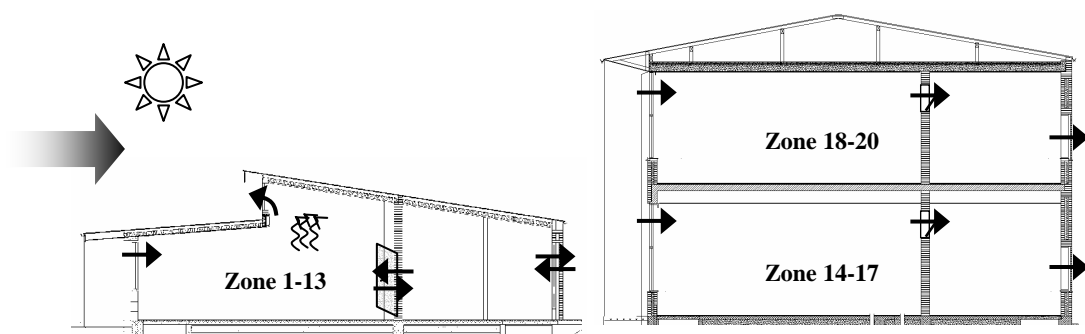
Ventilation principles of the natural ventilation in the school. Zone 14-20 have openings in the internal walls facing the corridors in order to provide cross ventilation.
